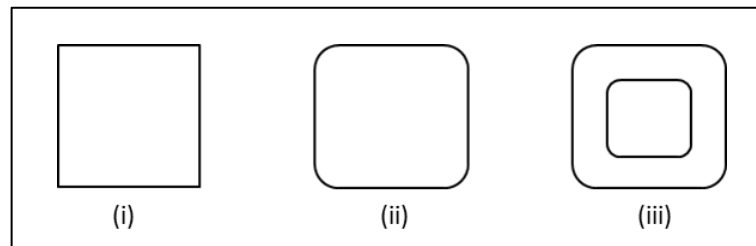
Rectangular Floor plan shape with (i) sharp corners, (ii) Rounded corners, (iii) rounded corners and central air shaft
